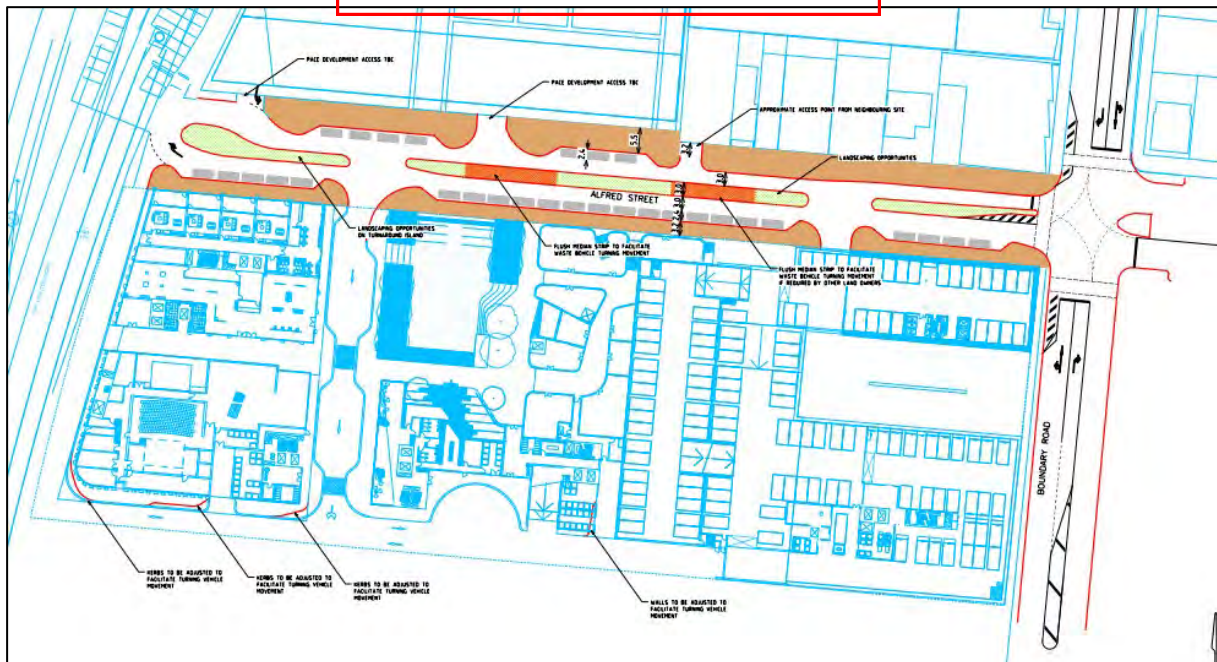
Approved plan of access to site – GTA Report (22/11/2019)
